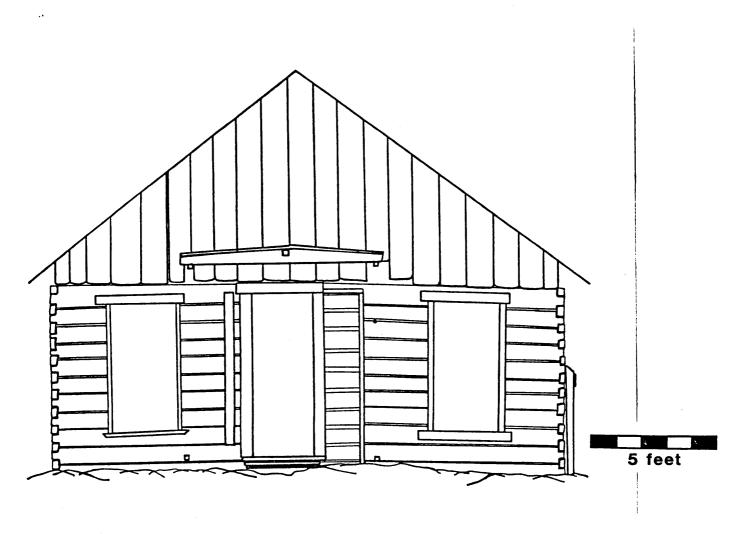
Elevation of the front exterior wall of Feature 9. This building, still in fairly good condition, once served as Orion Kirkpatrick's freight depot.
